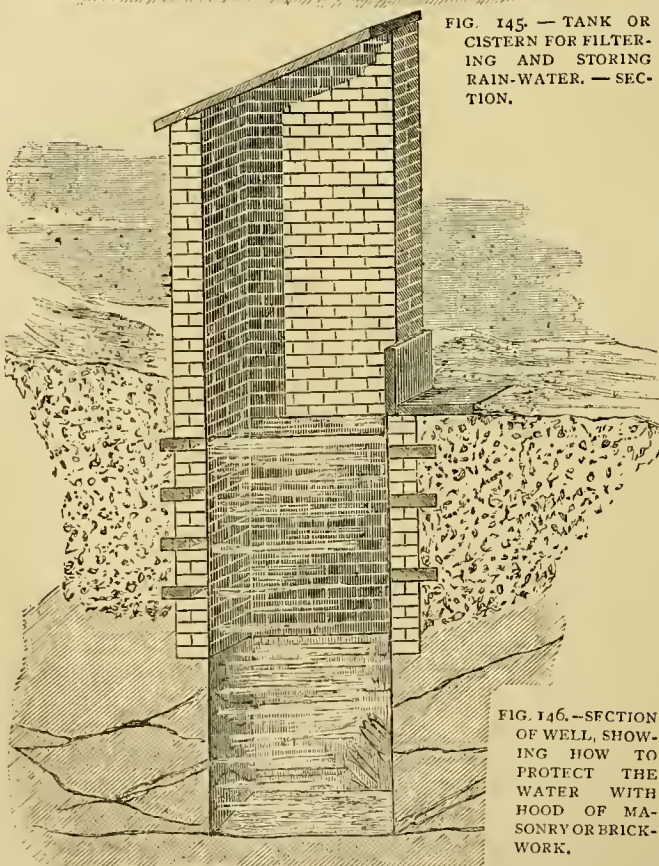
SECTION OF WELL, SHOWING HOW TO PROTECT THE WATER WITH HOOD OF MASONRY OR BRICKWORK.
